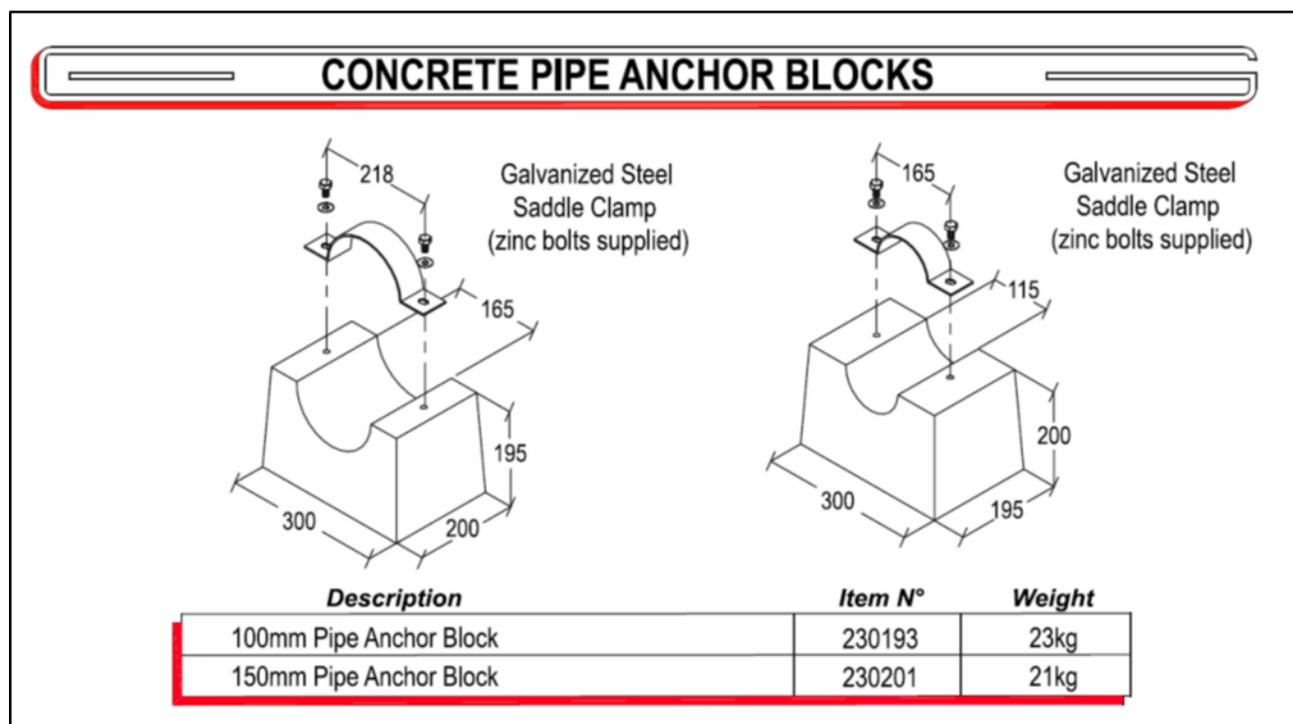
illustrates the indicative type of concrete anchor proposed to be seated on the 1m wide pebble stabilising bed.
